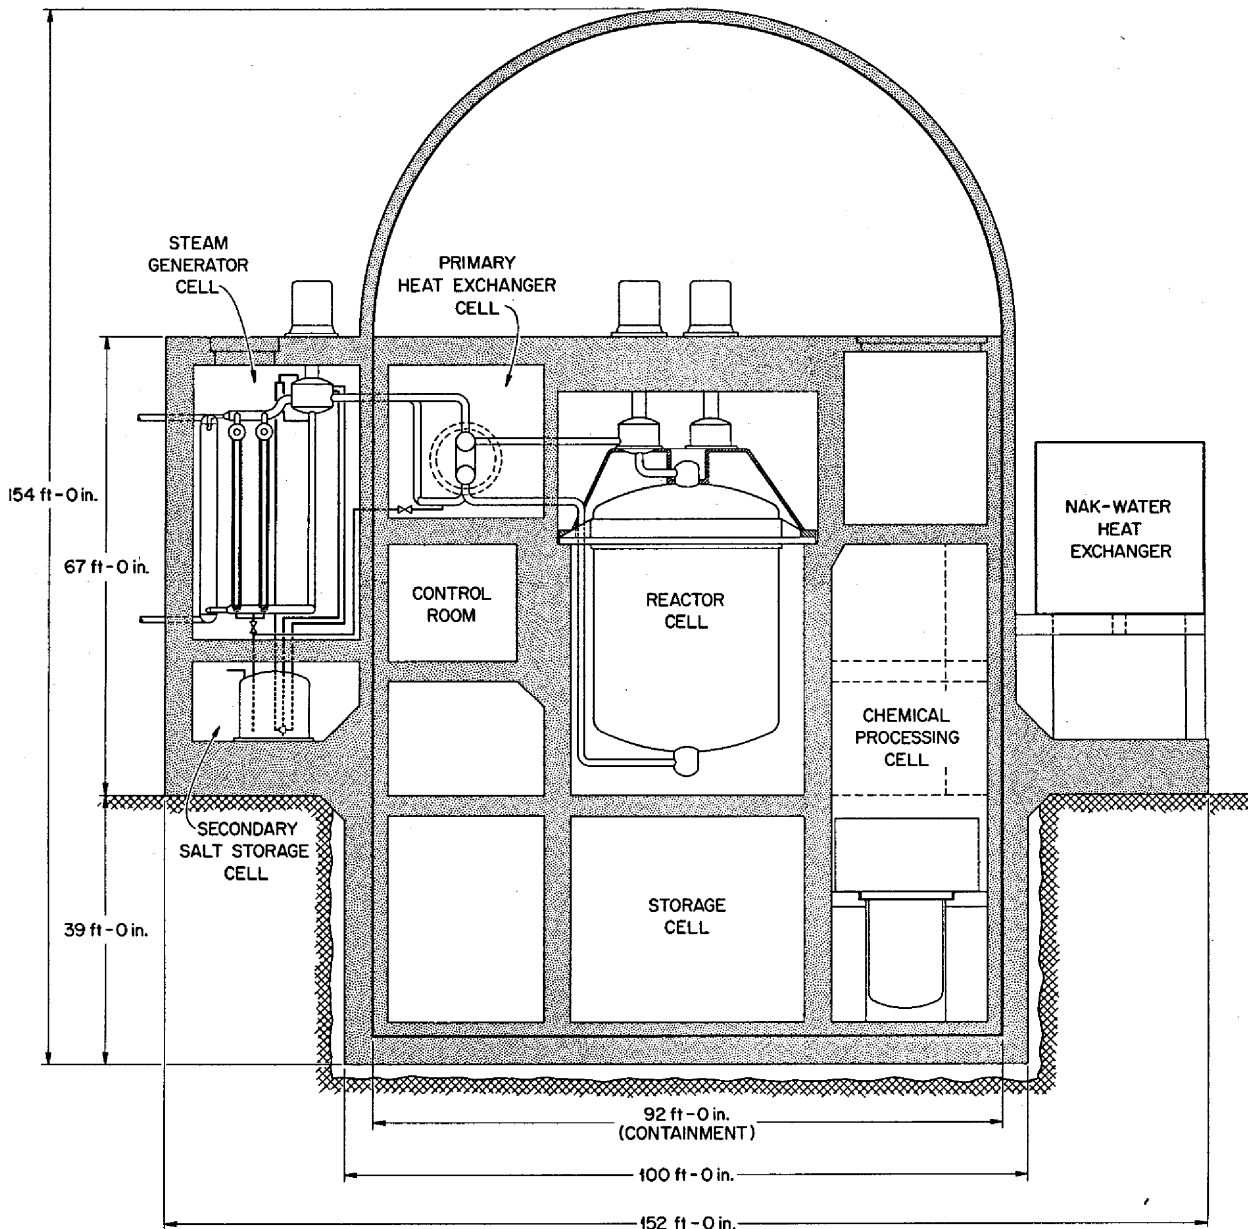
Sectional Elevation of Confinement Building, Section XX.
